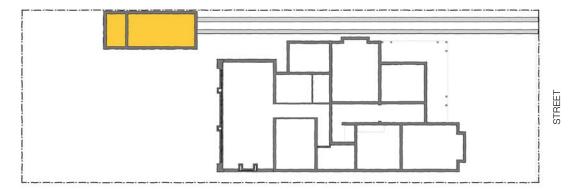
LOW IMPACT DEVELOPMENT AT REAR OF DWELLING IN HERITAGE CONSERVATION AREA
